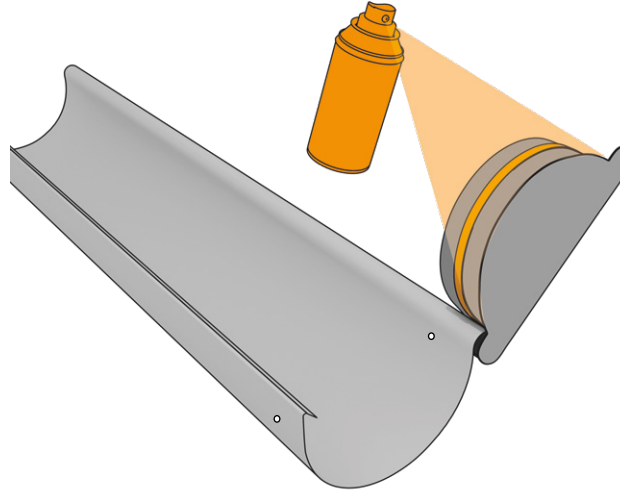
SHAPING THE GUTTER FOLDING AND RIVETTING THE END CAP
